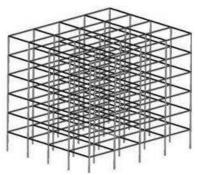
The 6-Storey Reinforced Concrete Building Structure Specimen.
